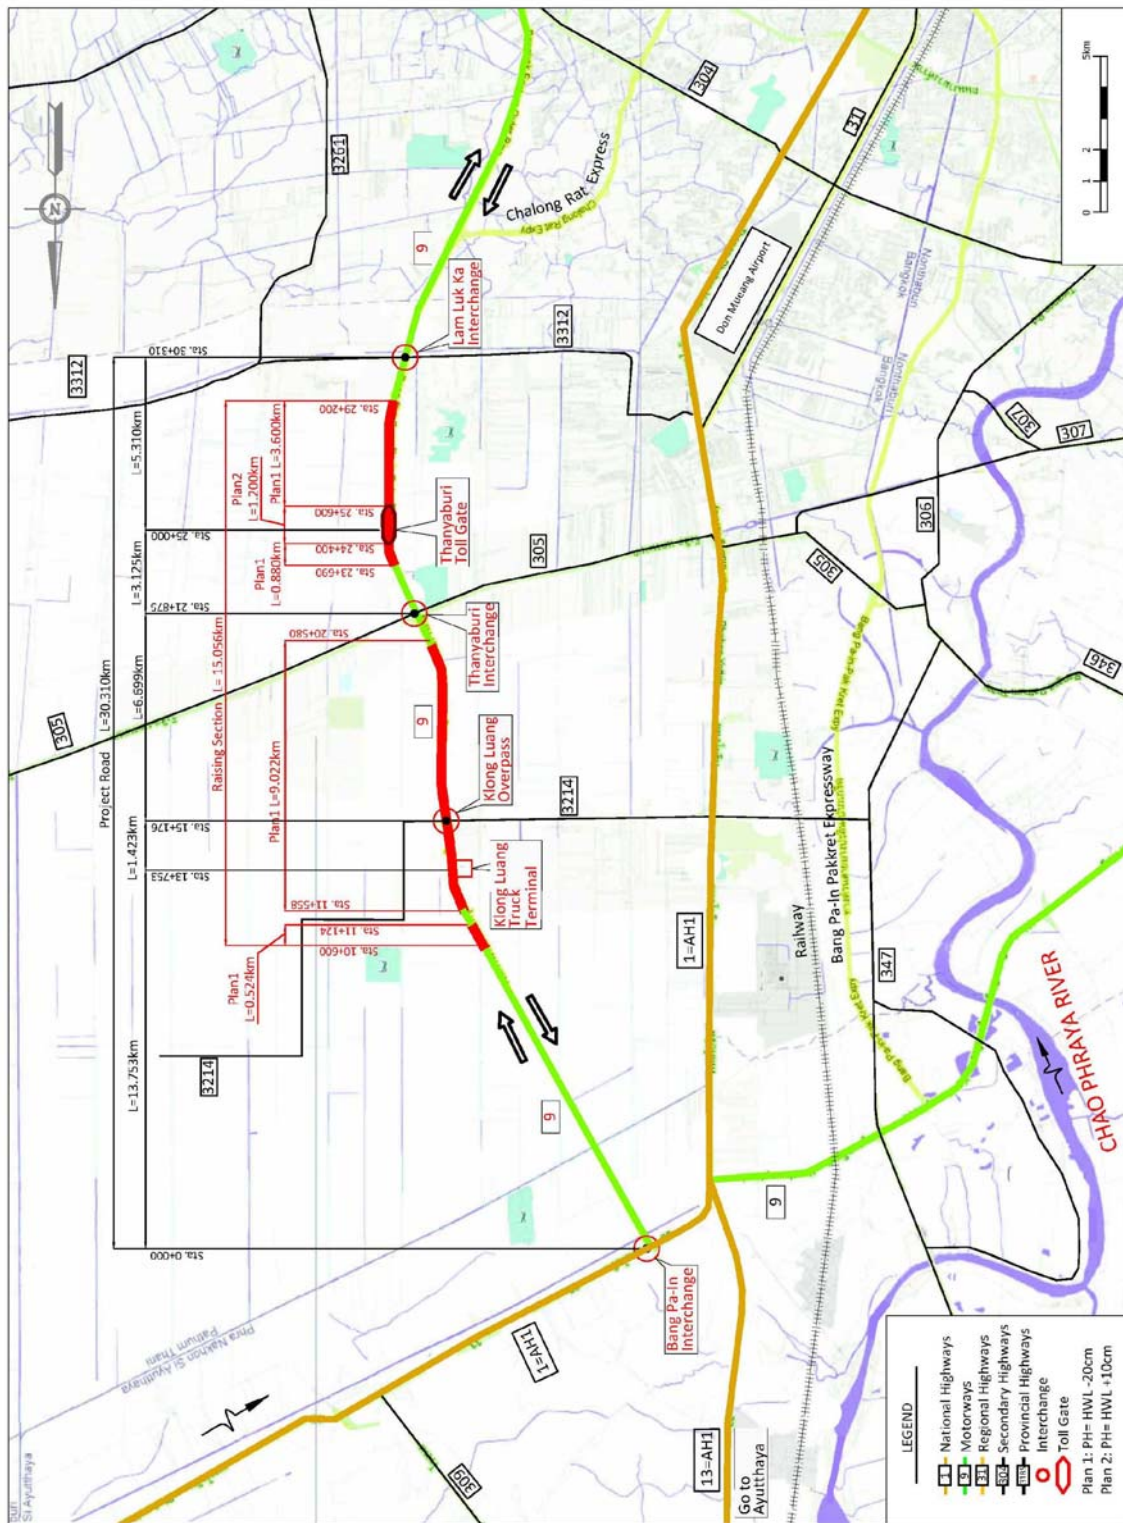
Objective Section of the Project and the Sections to be Raised
